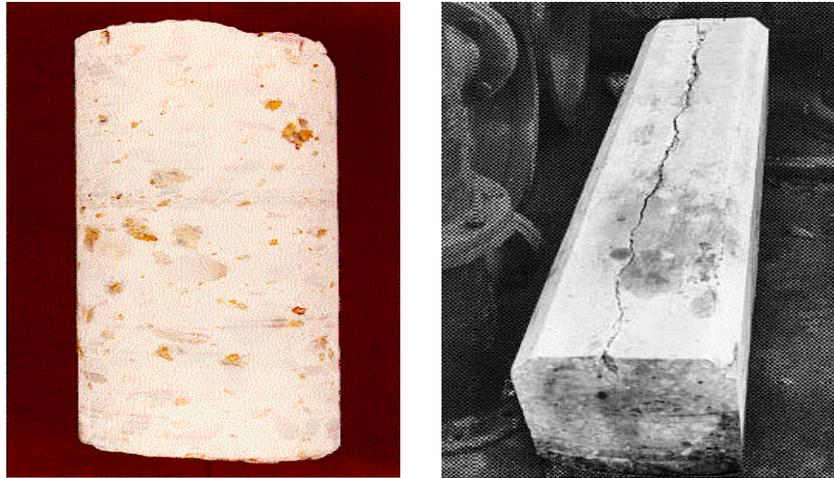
(a) Brown spots of a concrete core after ASR; (b) Concrete beam cracked after ASR (BRE 330 Digest1)
